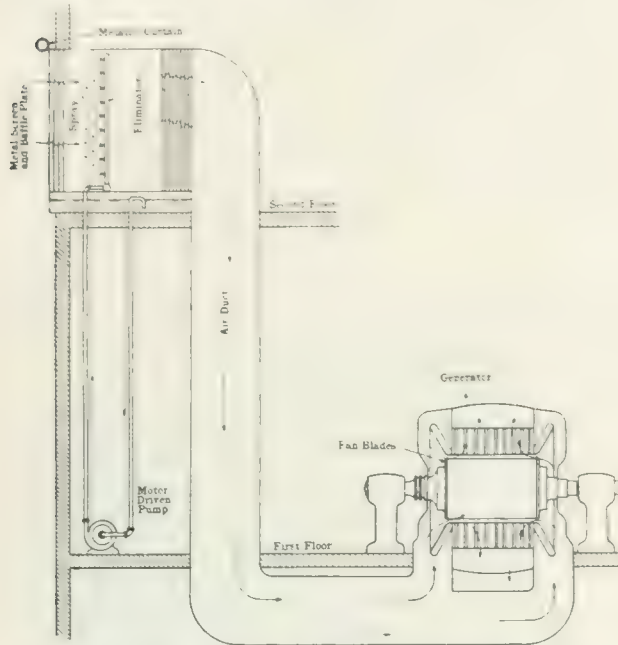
DIAGRAM SHOWING COMPLETE EQUIPMENT LAYOUT USED IN HUMIDIFYING AND TRANSMITTING OF AIR FOR COOLING PURPOSES
